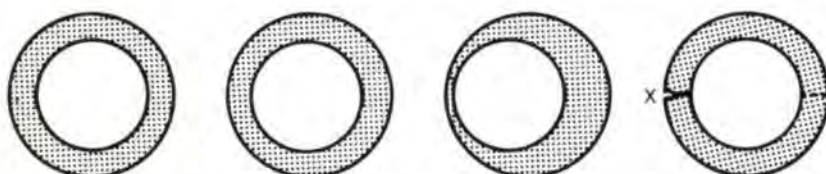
Hollow circular cast iron columns are rarely found to be concentric and are often made up from two halves: problems can ensue.
